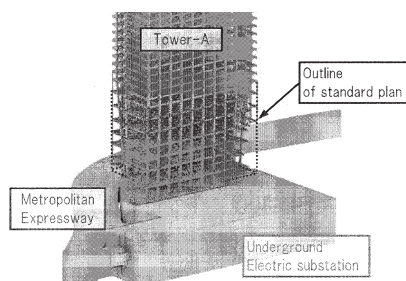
Relationship between Tower-A, Metropolitan Expressway and Underground substation
